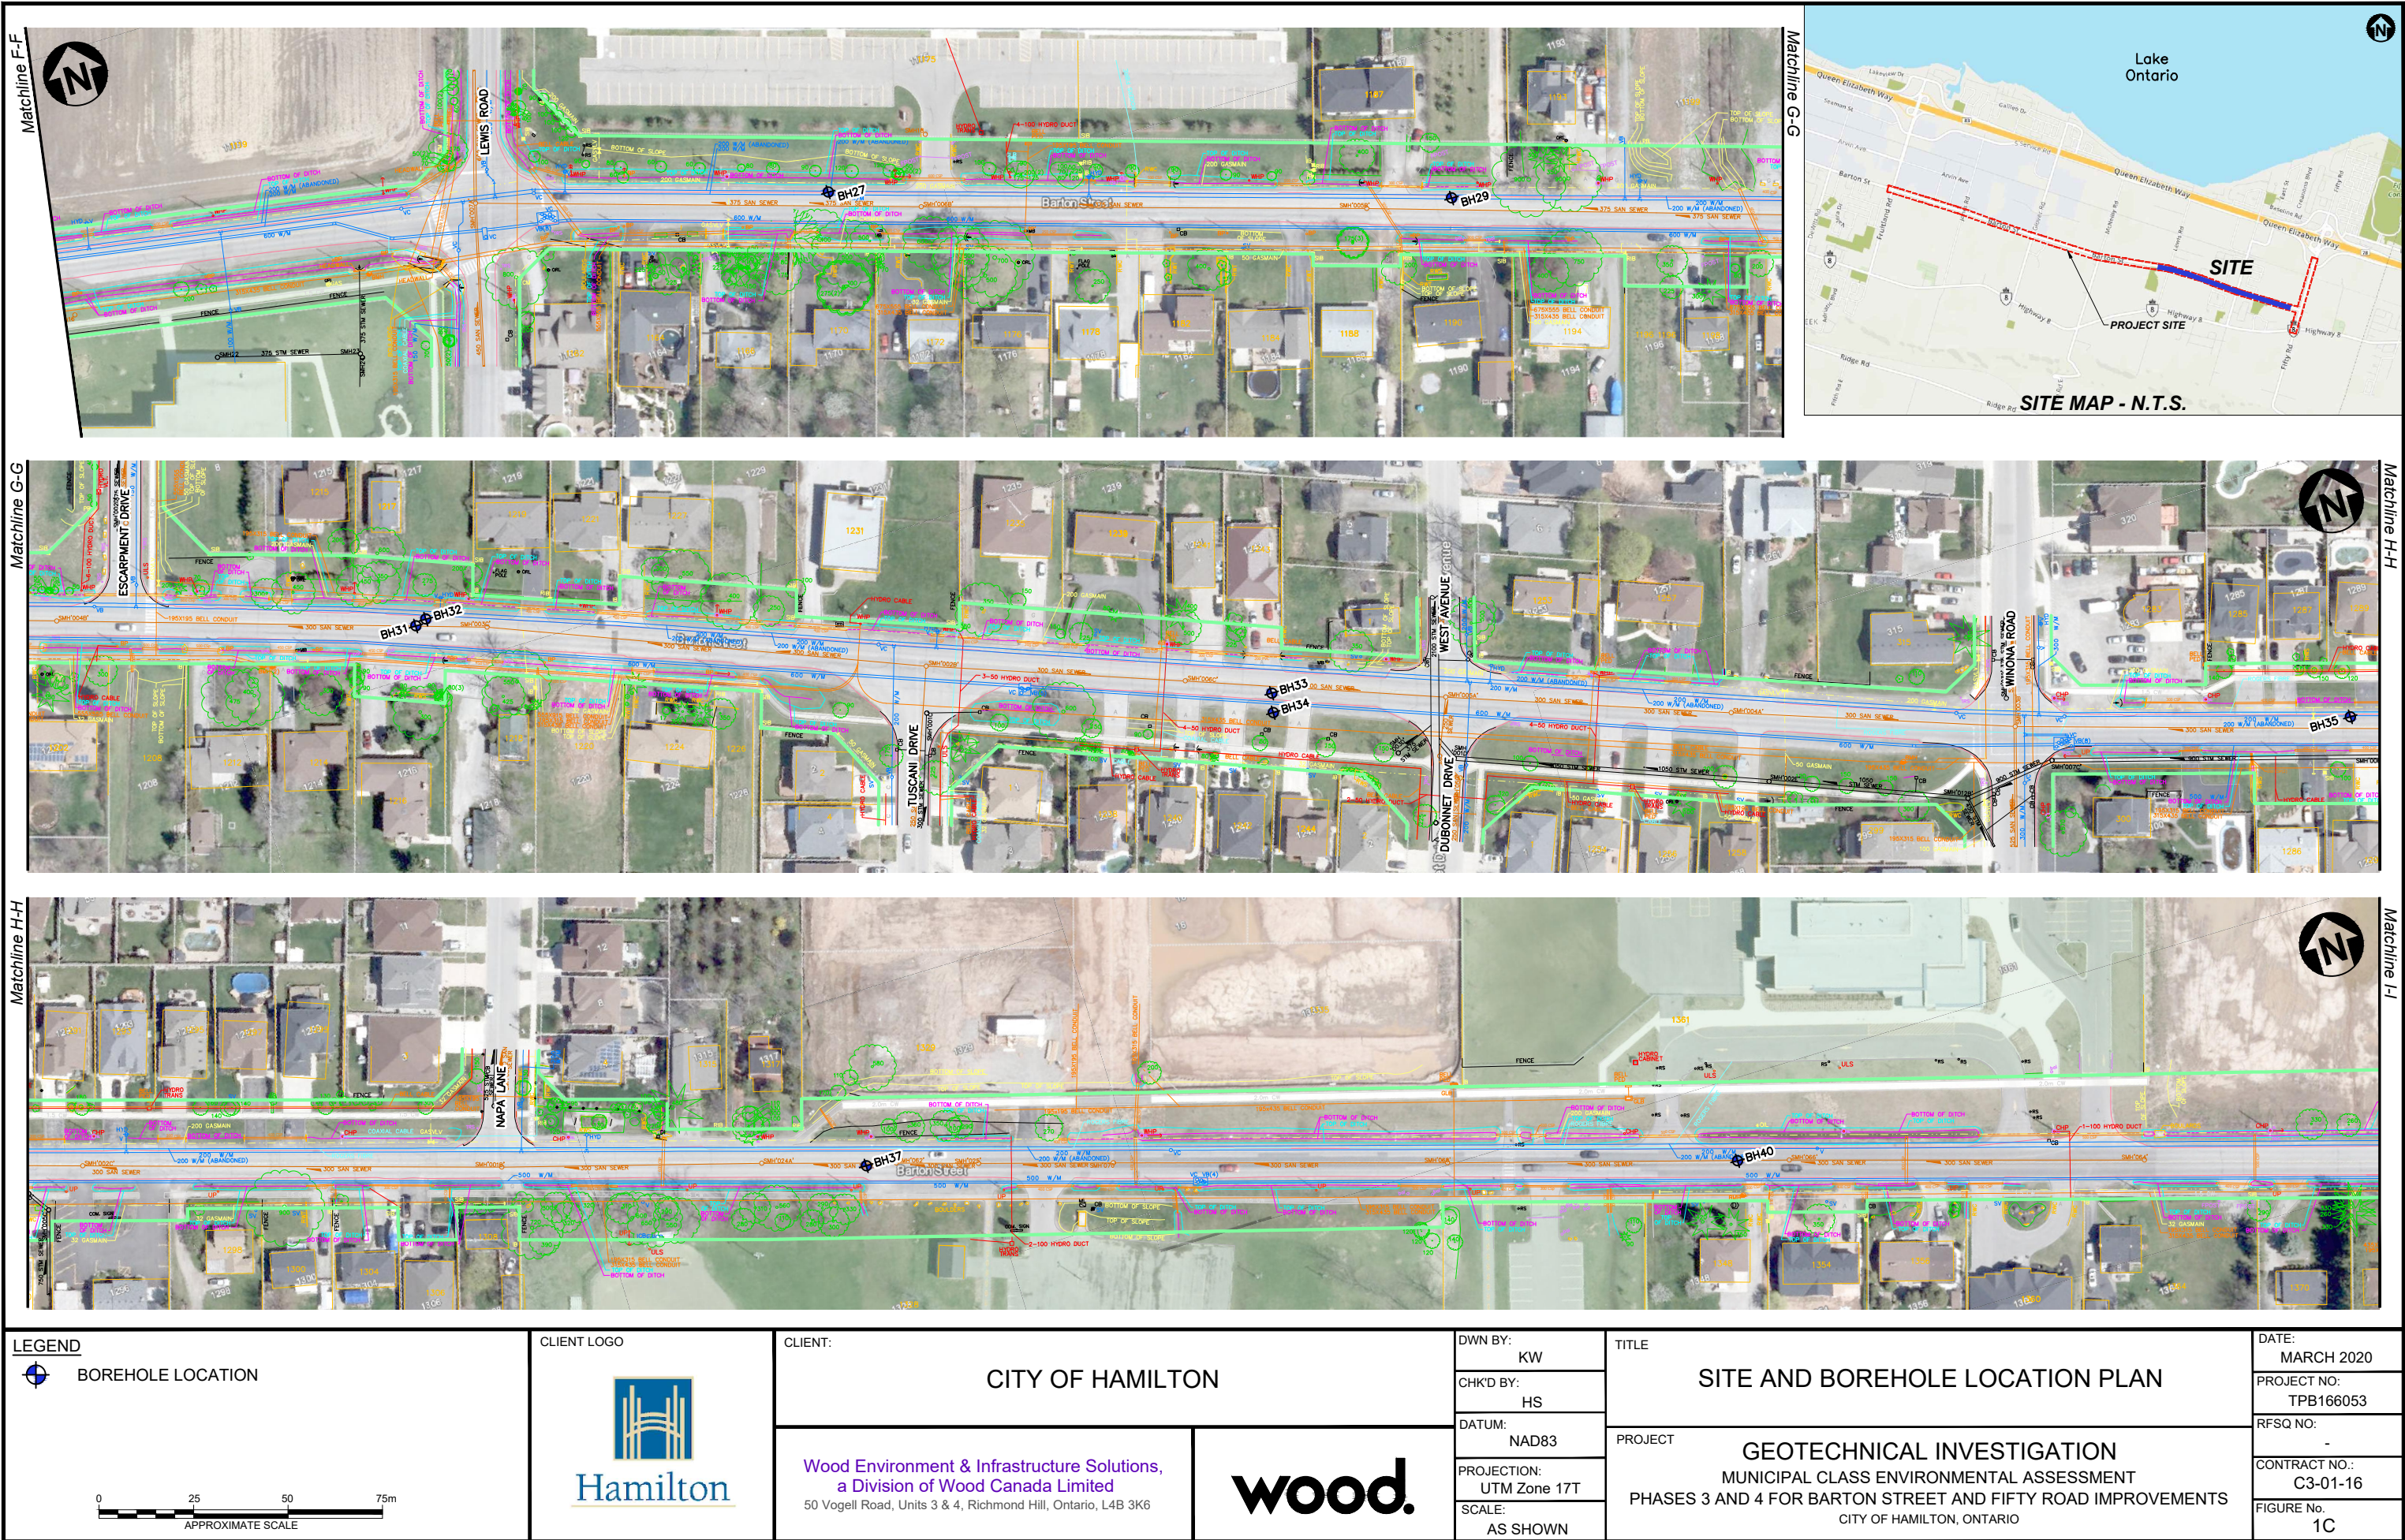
A to 1D:	Site and Borehole Location Plan
